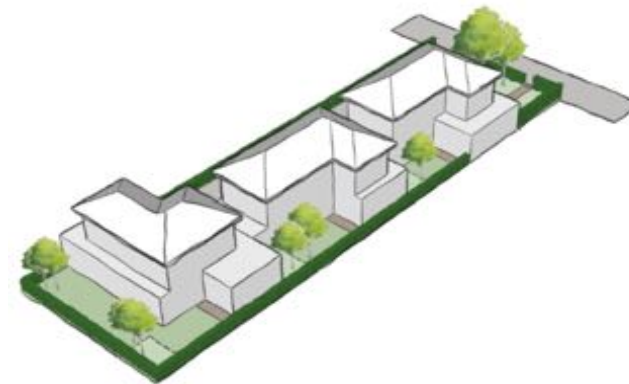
Townhouse development constructed with the new 35% minimum garden area requirement.
